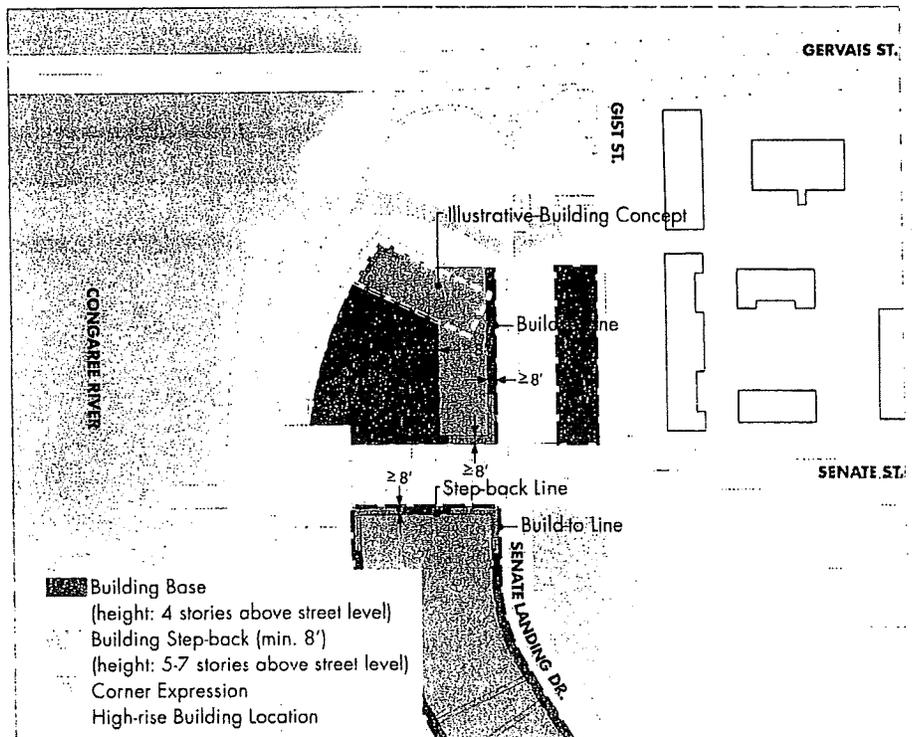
SENATE STREET LANDING BUILDING ENVELOPE
